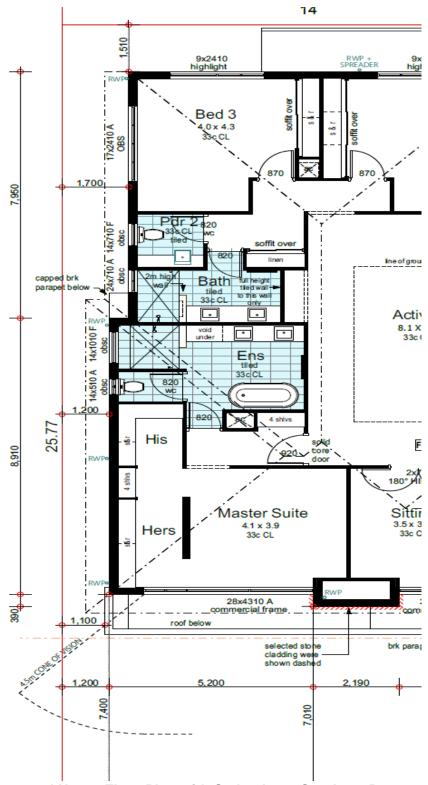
Proposed Upper Floor Plan with Setbacks to Southern Property to Left of Image
